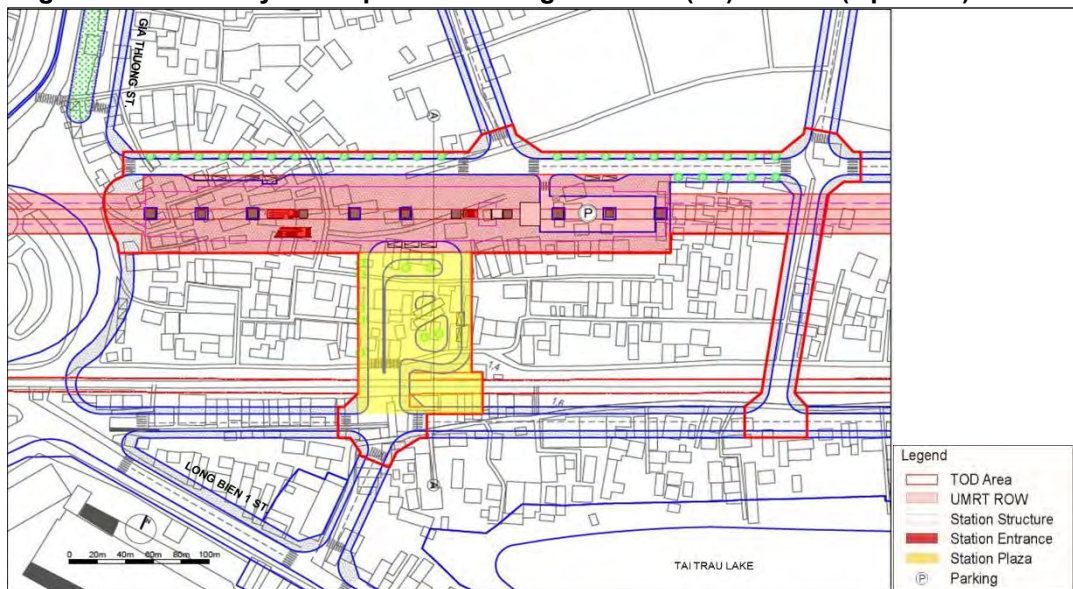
Facility Concept Plan at Long Bien Bac (V5) Station (Option B)
